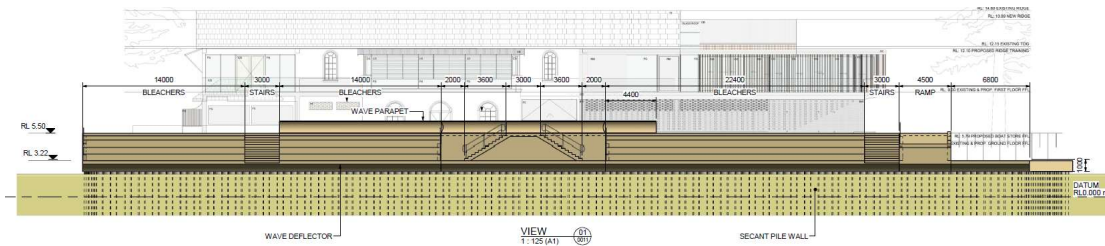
Eastern elevation of the Surf Lifesaving Club building with a view of the proposed coastal protection work as seen from the beach fully exposed. The structure forms a plinth supporting a promenade with the building on top. Selected lengths of the promenade contain the curved wave parapets designed to protect the original building. (Source: Royal Haskoning DHV, dwg PA2407-RHD-00-105-DR-MA-0021 - Rev P01)
